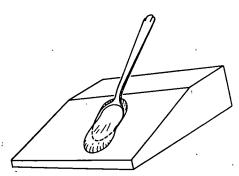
Spoon-shaped slope failure. Slope failures are often spoon-shaped, as in this sketch, or cylindrical as shown in Figure 9.
